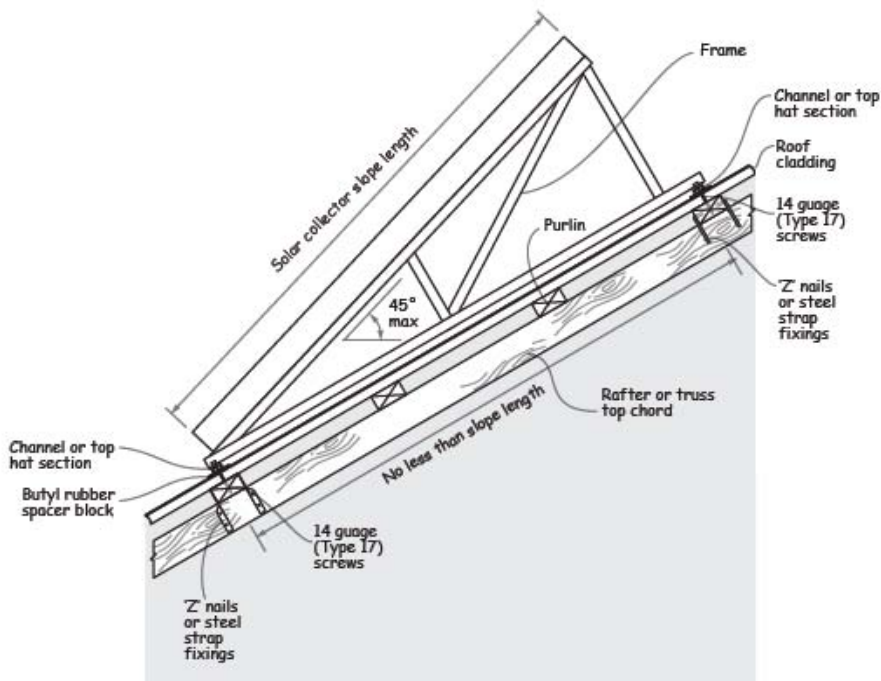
Solar collectors at a different pitch to the roof supported using frames (section view)
